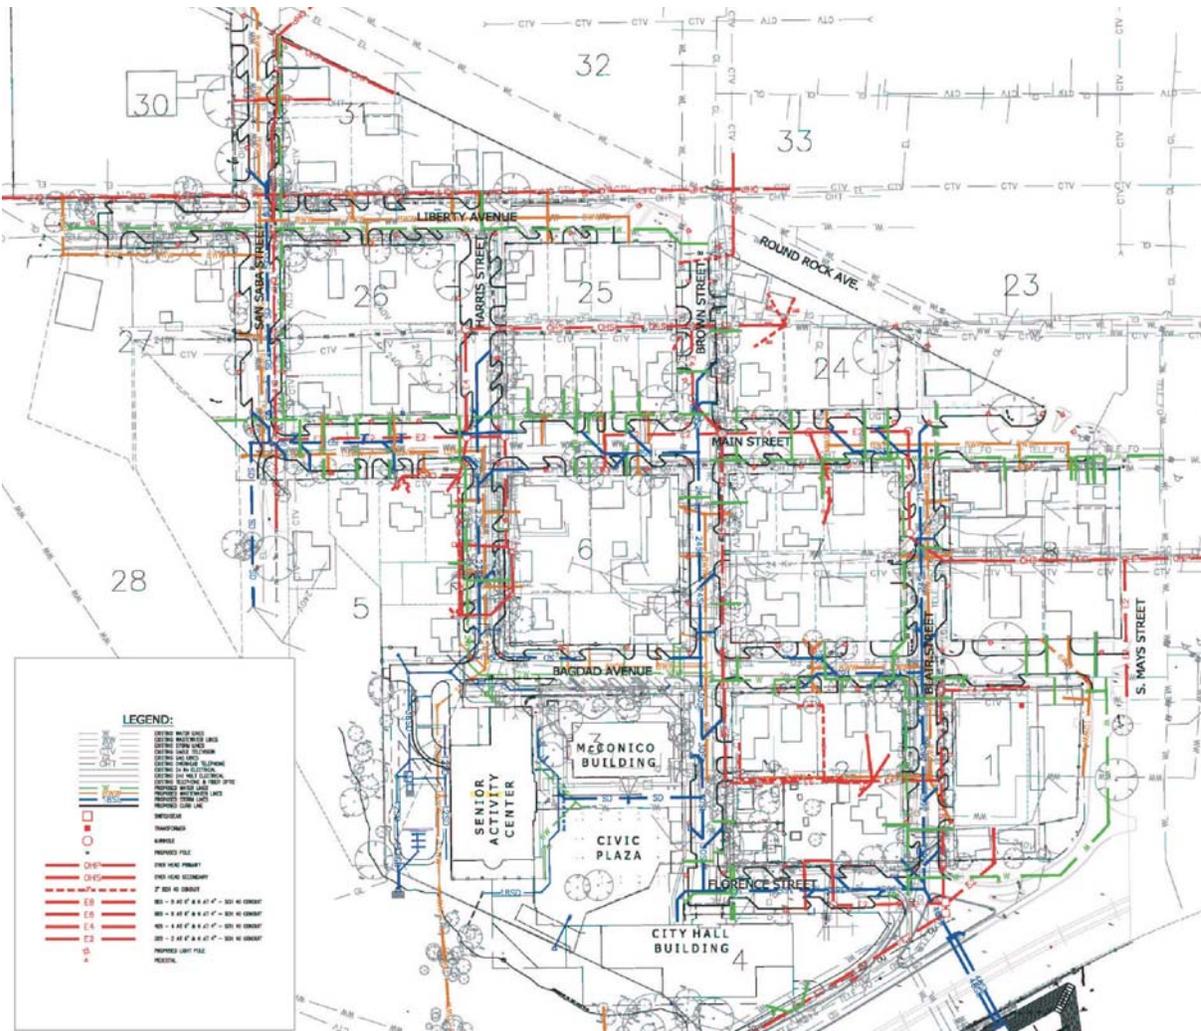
Current and Proposed Combined Utility Plans. Dry utilities (electrical, phone, cable – in red) will be moved to underground conduits, allowing lines to be added without requiring the excavation of existing lines. Water (green), wastewater (orange), and gas (black) service will be upgraded. Stormwater (blue) will be diverted to centralized water quality ponds. Tree roots and other impediments may warrant minor modifications of the proposed combined utility plan. *Illustration: PageSoutherlandPage.
